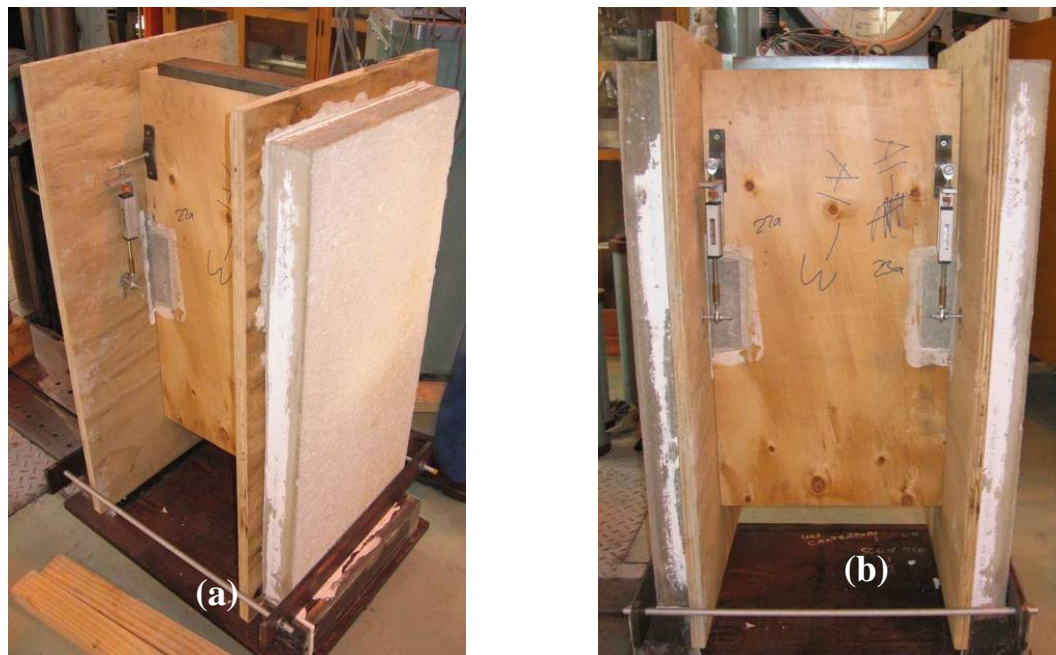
Typical push-out test specimen: (a) 3 dimensional view; and (b) Front elevation
